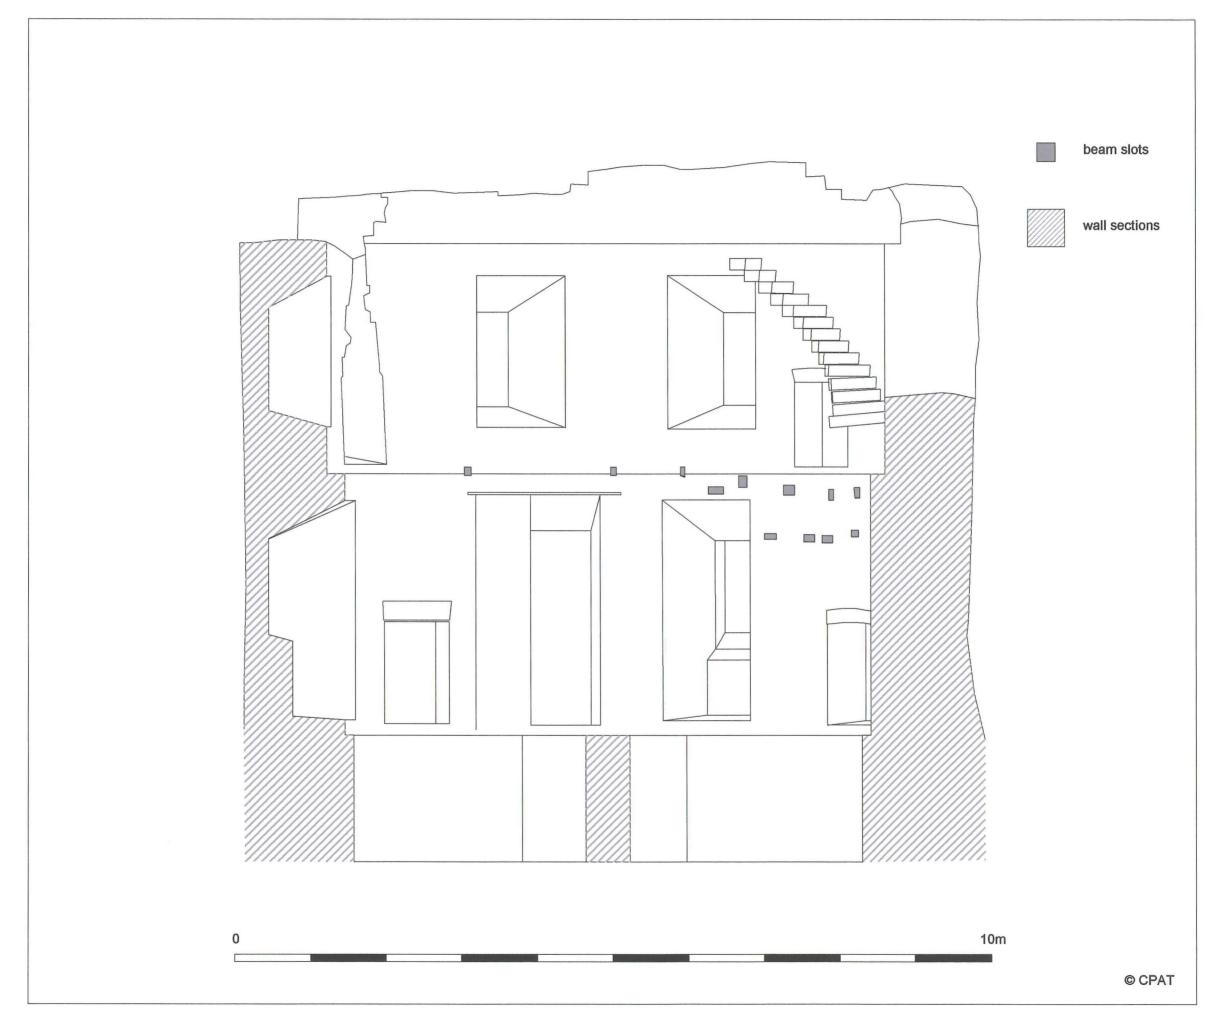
Roundhouse Farm south-west tower, internal section (F-F)
